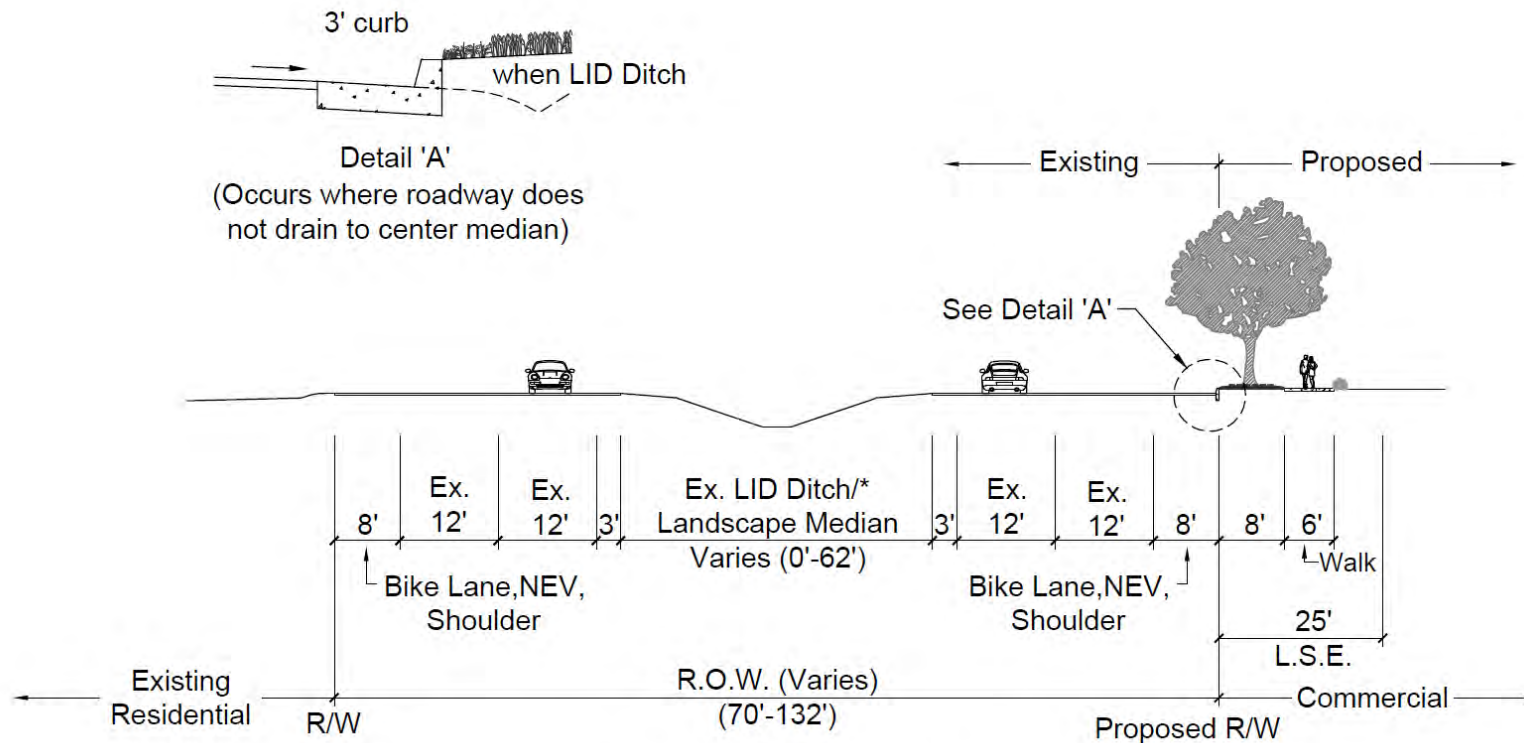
Hemphill Drive – Interim Two-Lane Road Section
